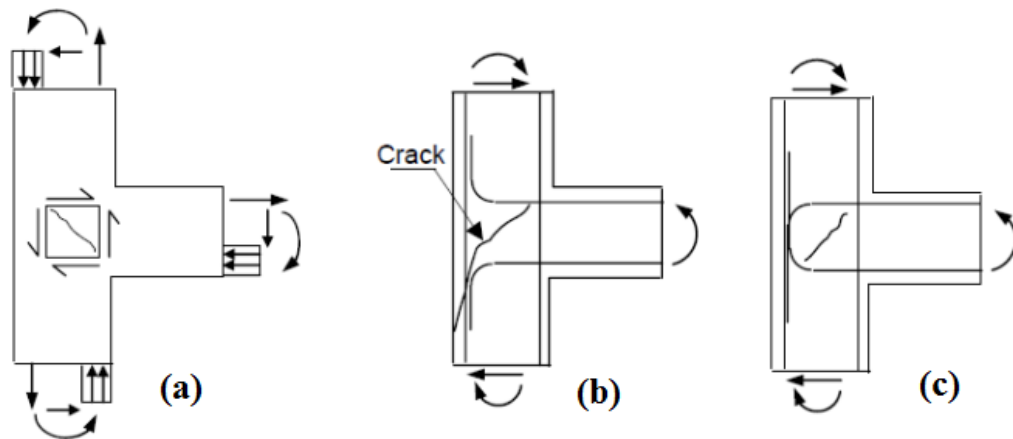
Diagonal Crack in Beam-Column Joints on Pulling
